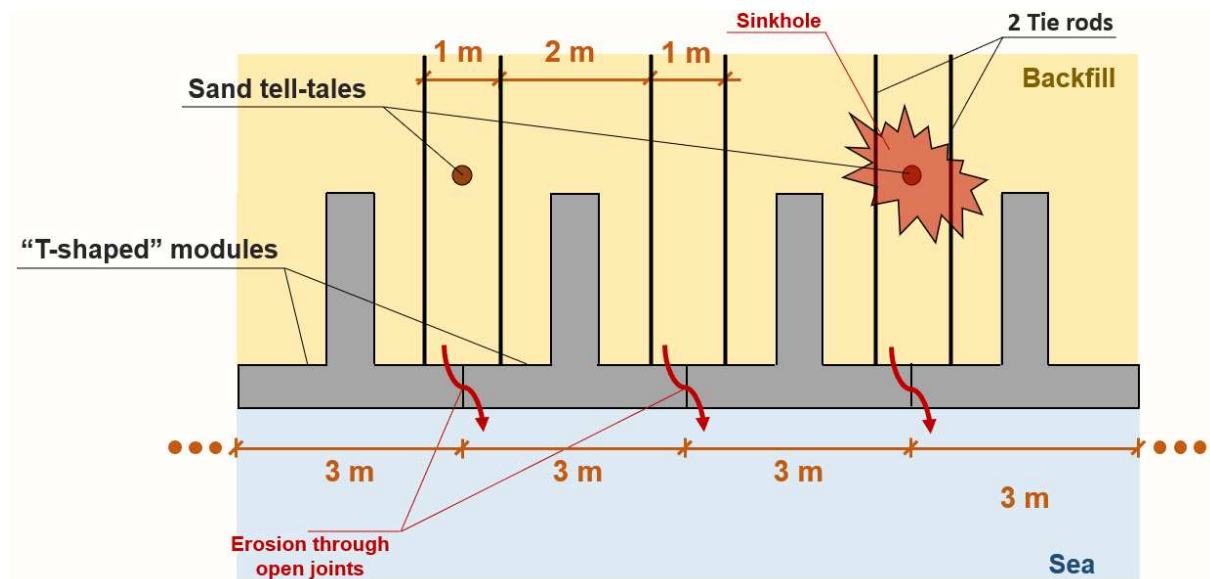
Detail of "T-shaped" modules of buttressed diaphragm wall and sand tell-tales devices in view of detecting incipient cavities.
